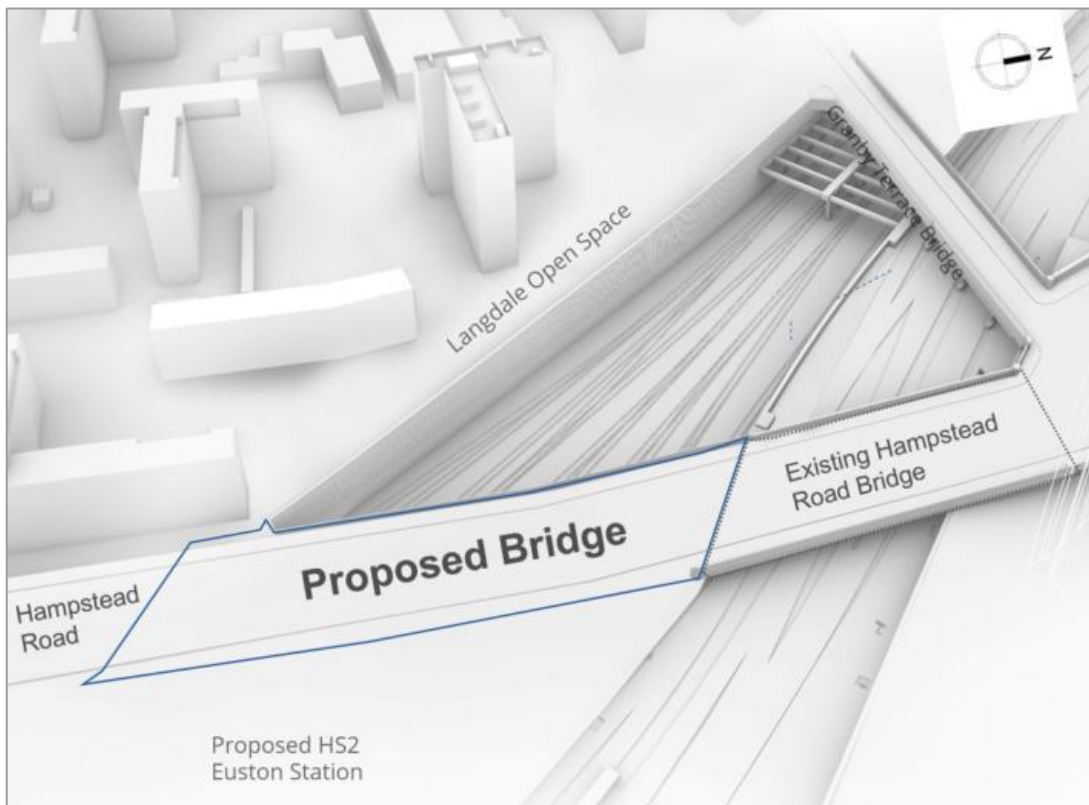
Hampstead Road Bridge will be extended to the south to span the new HS2 alignment (application boundary for the bridge extension is in blue)
